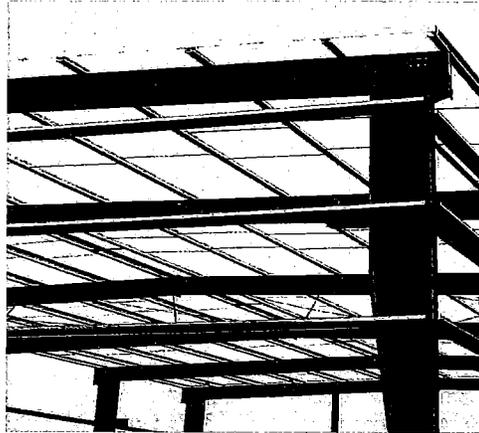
In the rigid frame, the column is narrow at the base and tapers to its widest point at the top where it meets the roof rafter. Note the lightweight purlins on top of the rafter (acting as a girder), which will support the roof deck.
